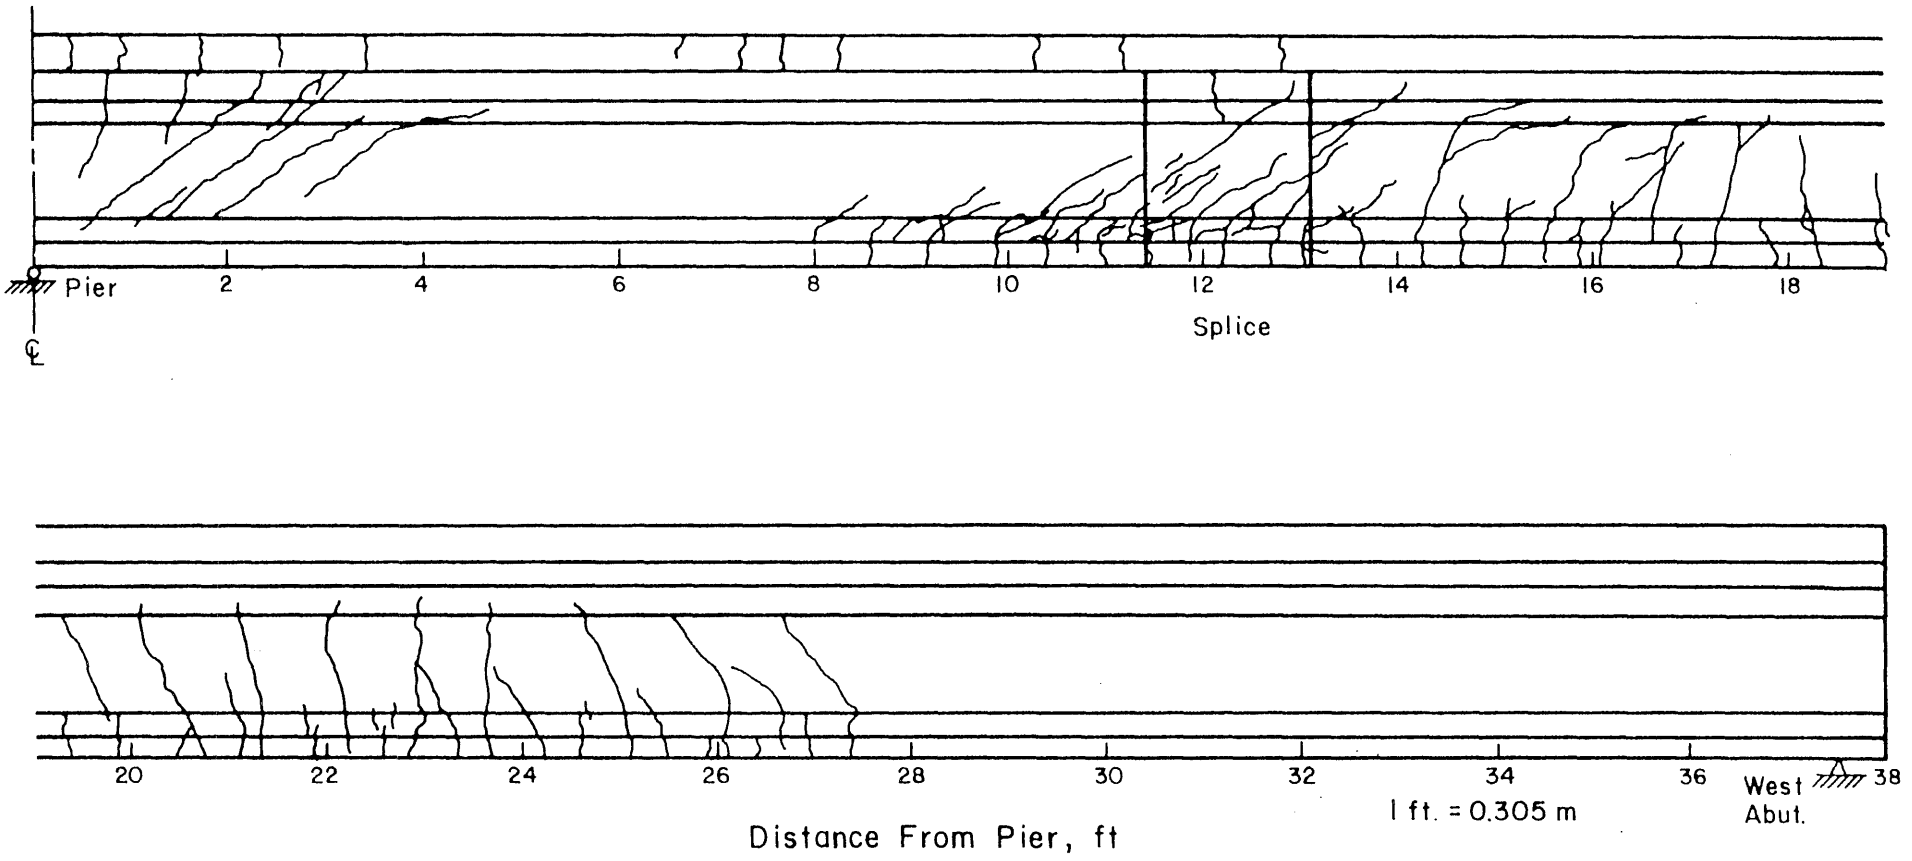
CRACKS IN WEST SPAN AT END OF DESIGN ULTIMATE LOAD TESTS, MODEL 2
